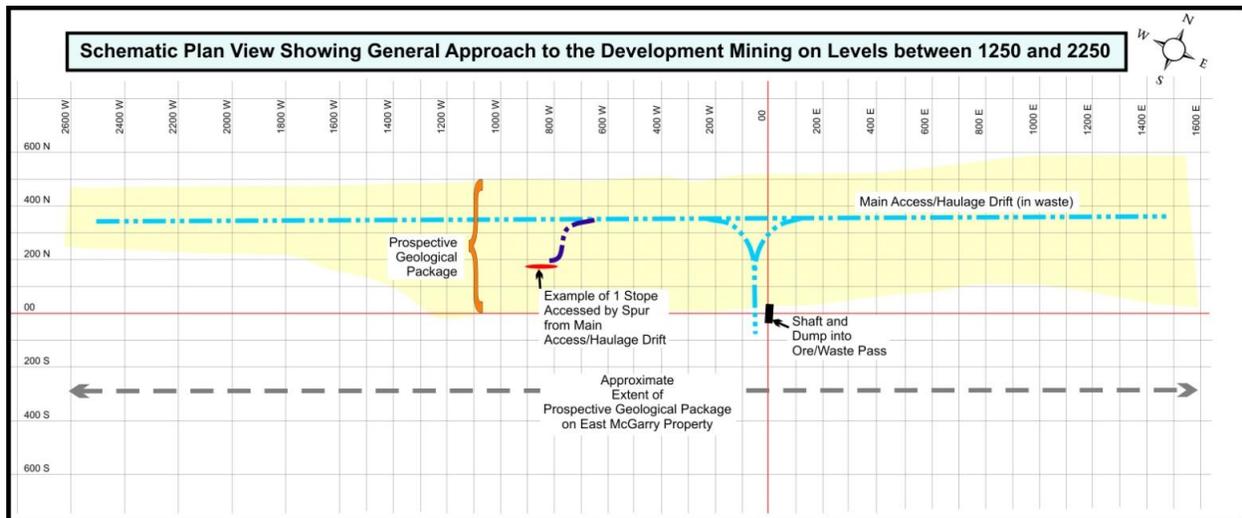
Schematic Plan Showing Strategic Approach to Development Mining - Upper Levels
